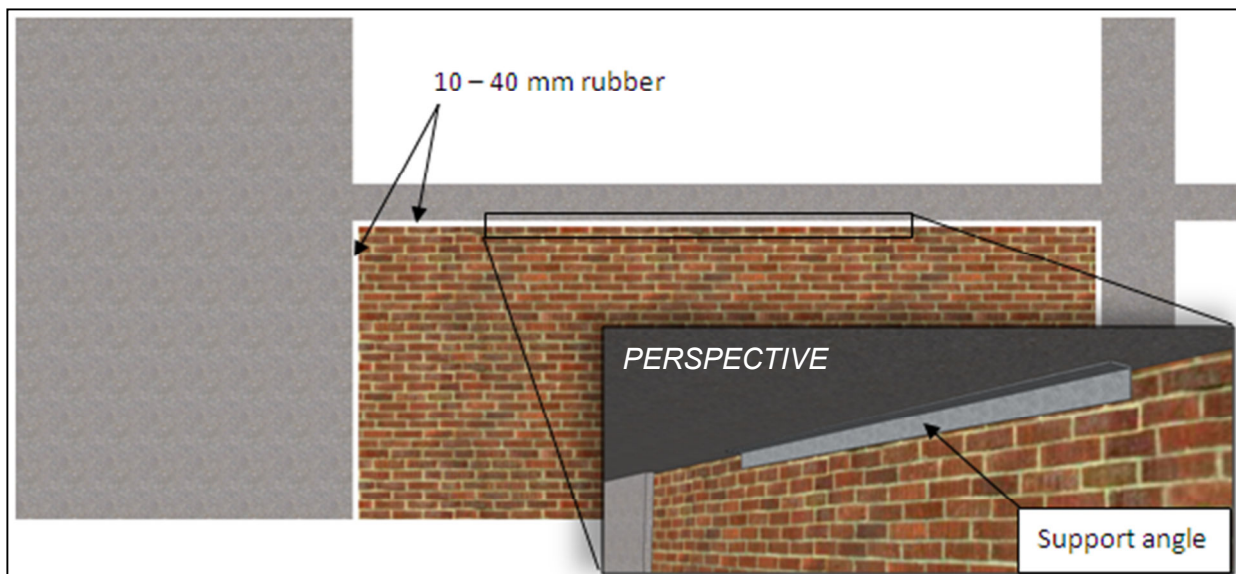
Separation of non-structural masonry walls (Elevation)
